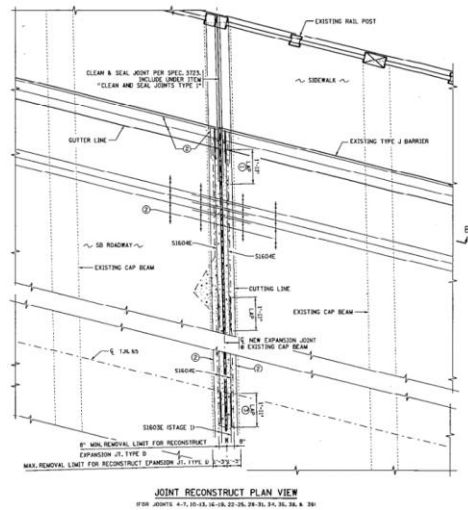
Half-deck plan showing strip seal in roadway only for joints located away from arch piers.
